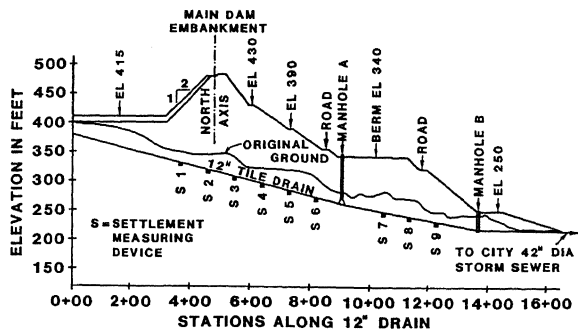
Cross-section Through Main Dam and 12-Inch Foundation Drain
